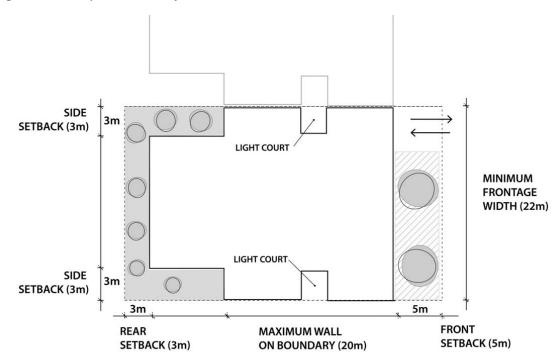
Garden Apartments Site Layout and Setbacks Plan
